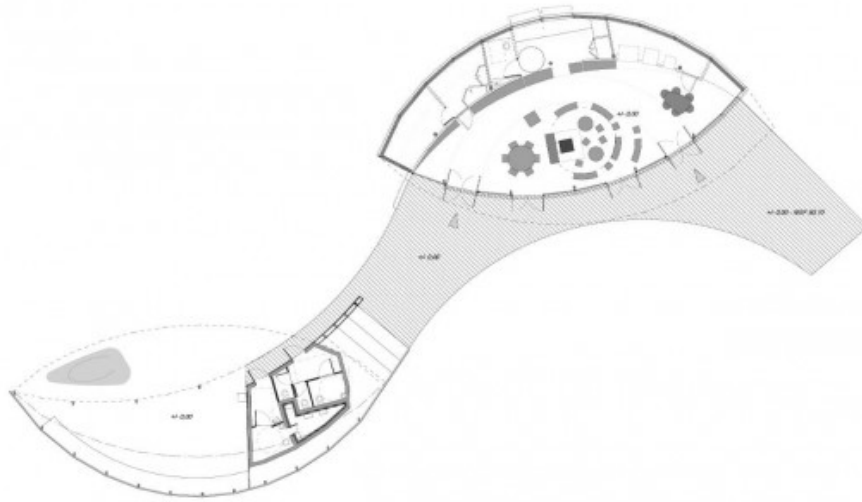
The plan of the Ecotourism Center (<http://www.archdaily.com/207883/ecoturism-center-in-france-inca-architectes/>)
